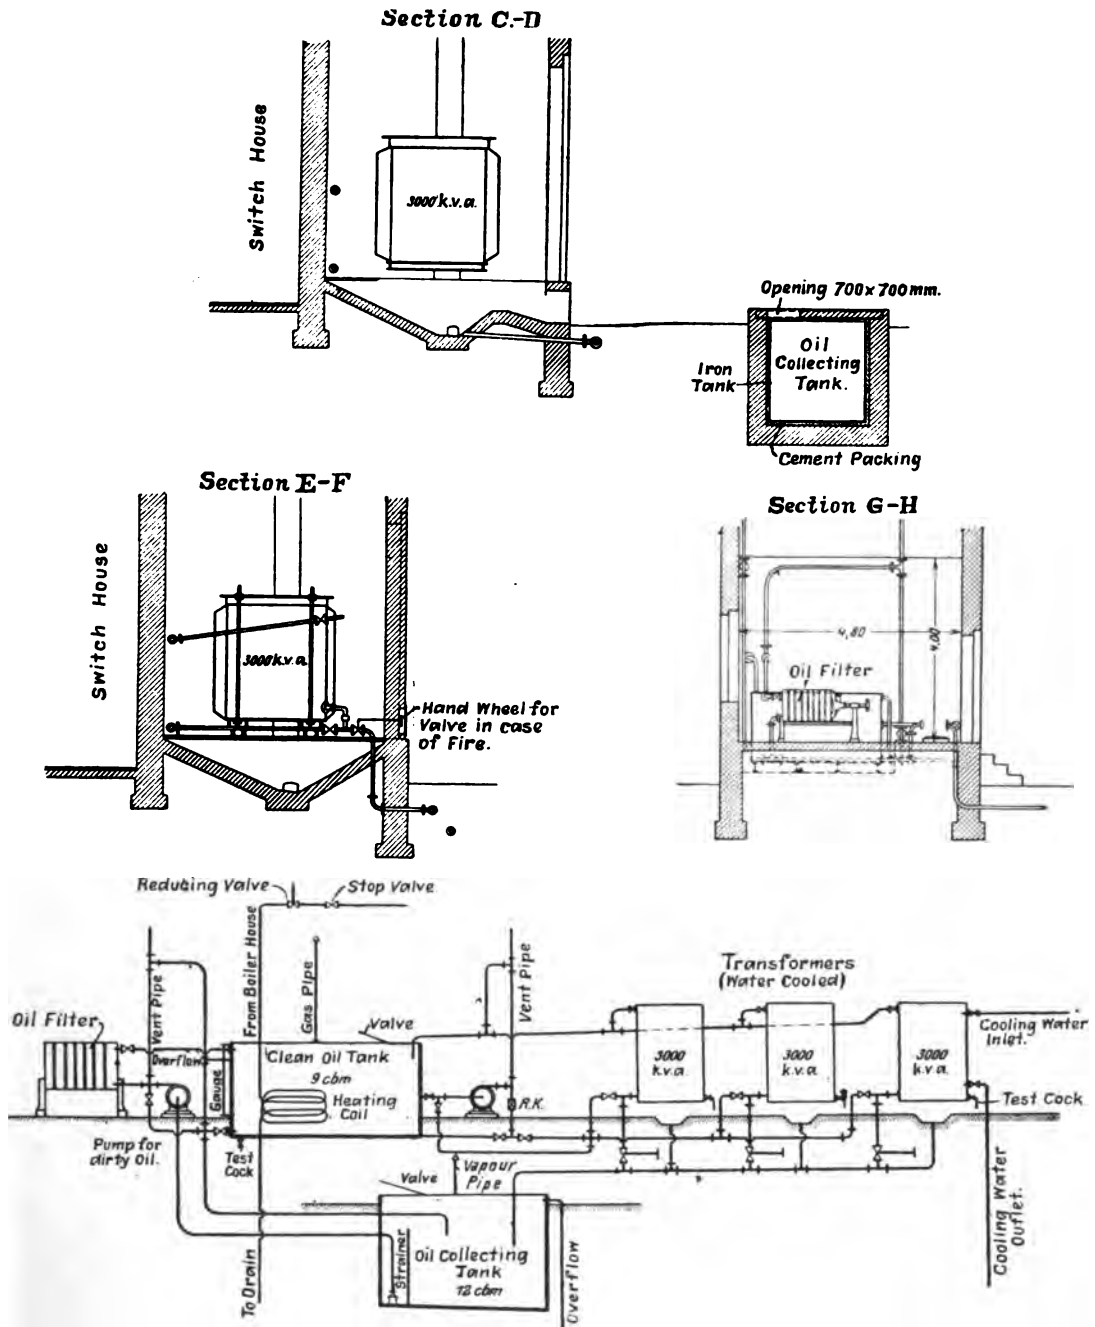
A.—Plant for Oil Cleaning in the Switch House of the Breitungen Electricity Works. Section through transformer chambers and oil cleaning chamber. Lay out of pipework. (Dimensions in metres.)
